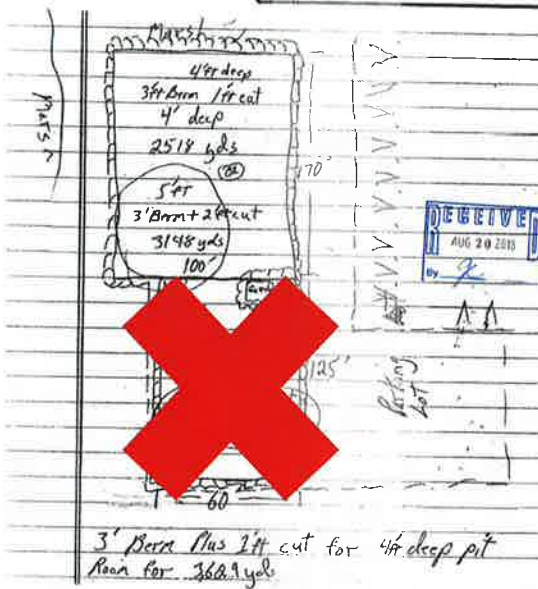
Plan view sketch of proposed disposal area (prepared by George Apple, Apple Marine Construction, Inc., dredging contractor).
